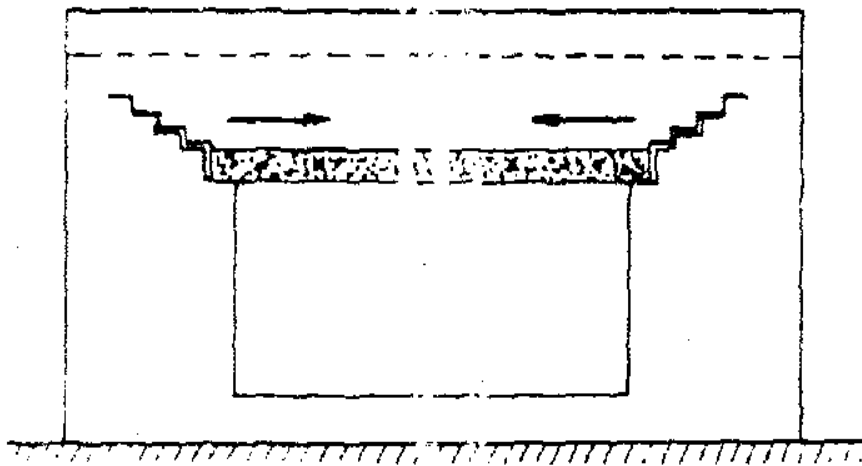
Diagonal cracks in brick masonry wall over Lintel of long span openings.
